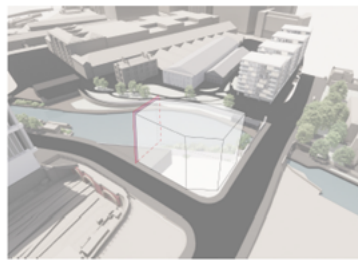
Chamfer west corner to make way for the tunnels and views through the site towards King's Cross Station
